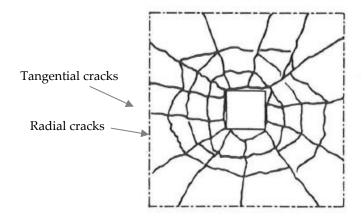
Crack pattern in the slab around the loaded area (Kölfors, 1993).
